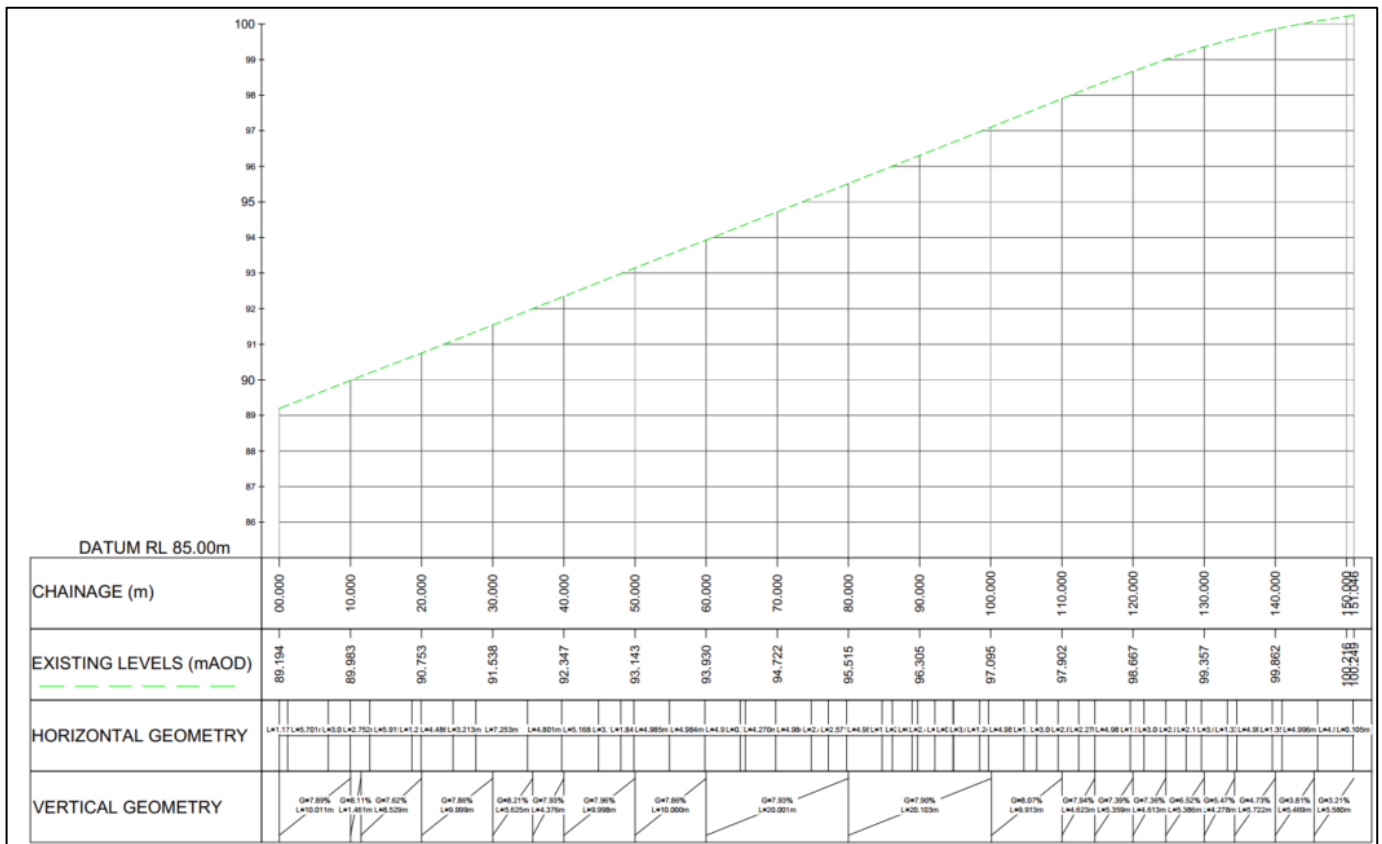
Existing Ground Elevation Profile of L1043 Killickabawn Road
